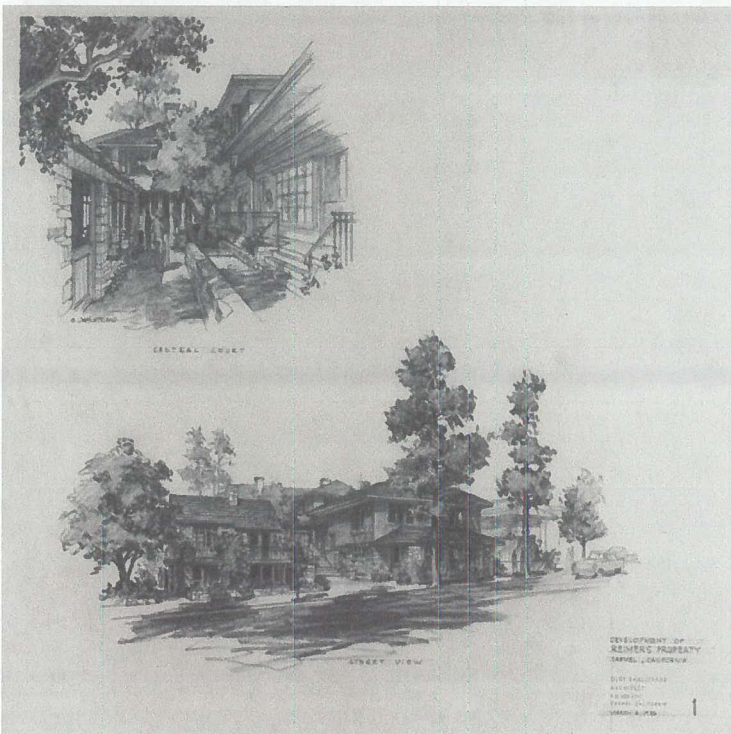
Reimers' Stonehouse Terrace, March 1976, view facing west (above) and northwest (below) graphite rendering by Olof Dahlstrand; Source: Reimers Family
